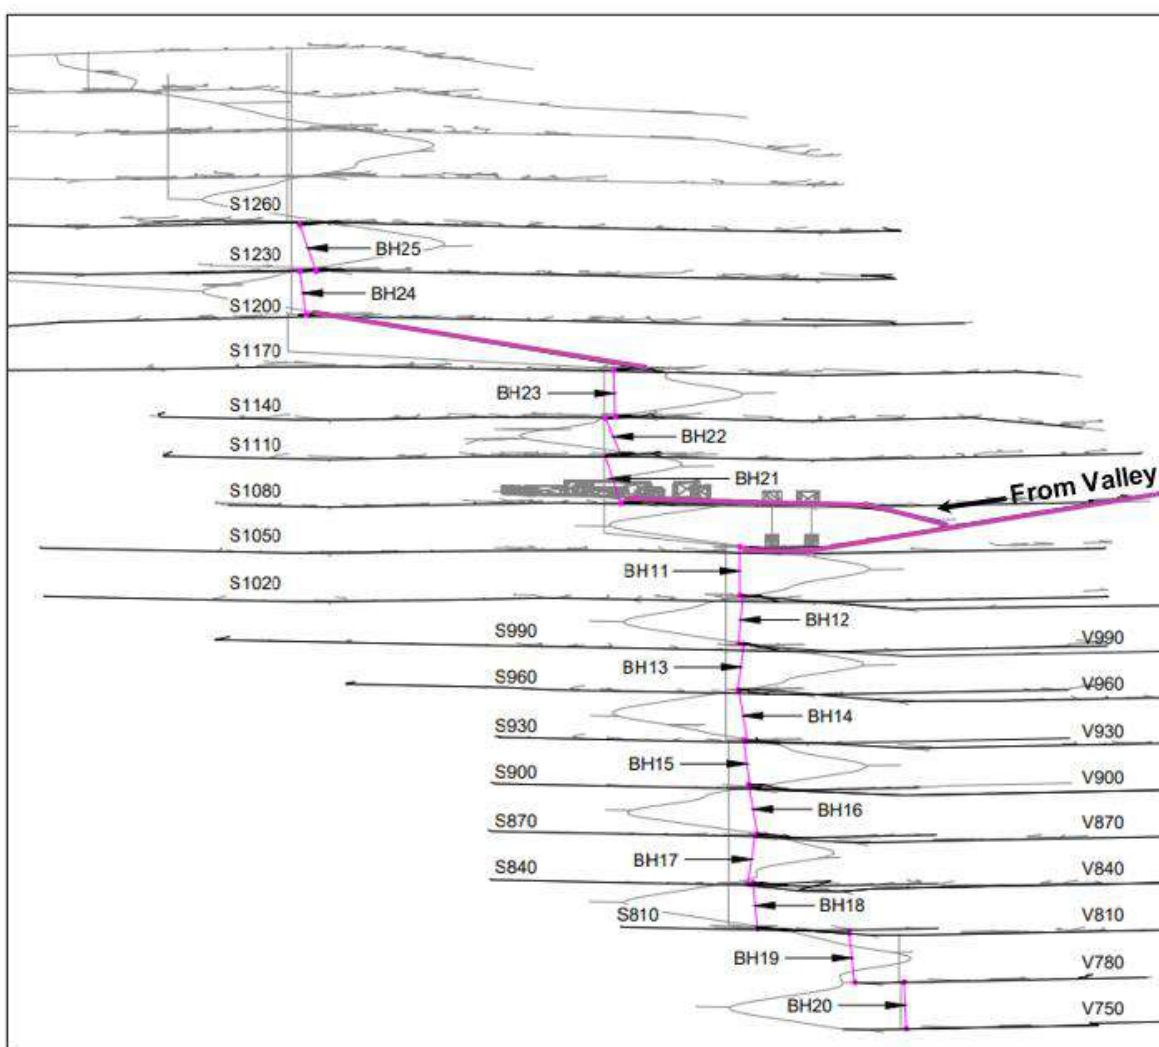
Pipe routing for upper and lower part of Shaft and lower part of Valley
